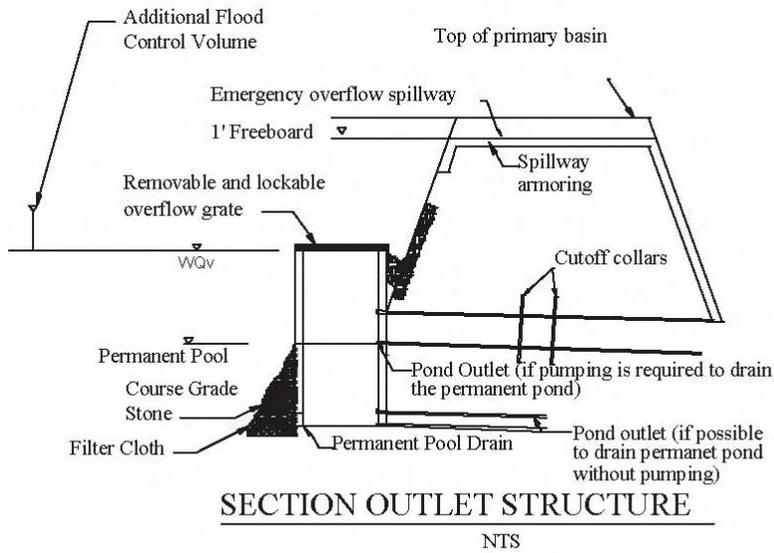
"V" Notch Weir Outlet Structure (2)
